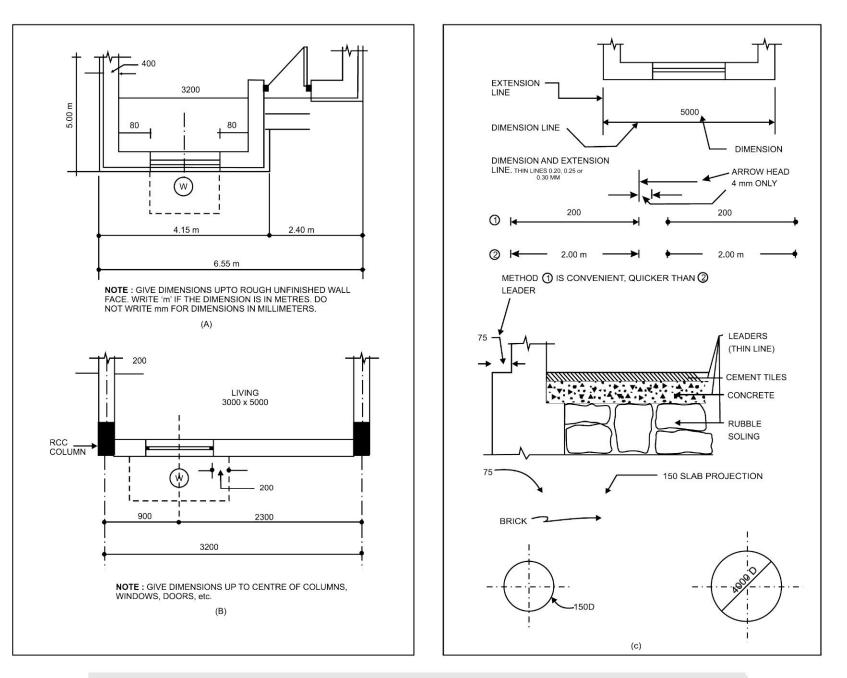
(A) Dimensions on a plan of a load bearing structure (B) Dimensions on a plan of a framed structure (C) Details-dimensions, leaders
